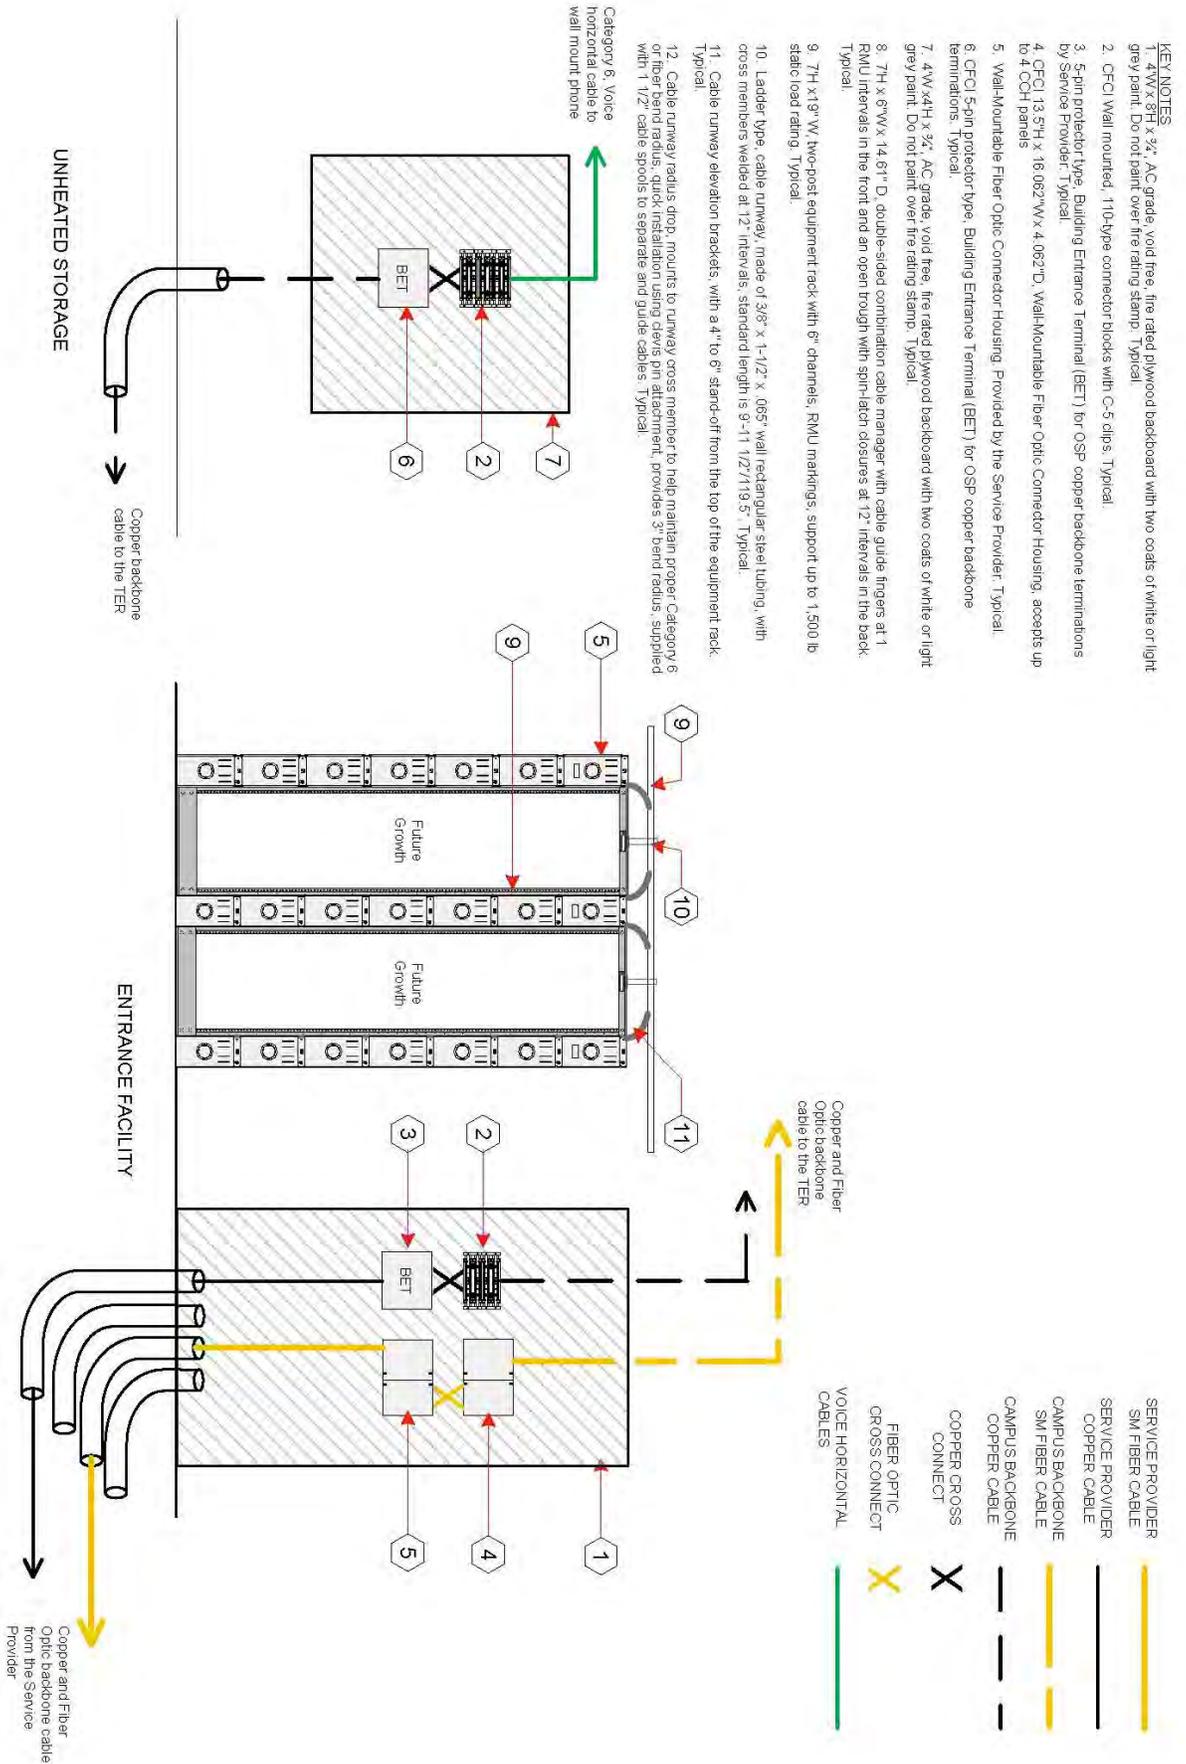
Typical Entrance Facility (EF) and UHS Elevations
